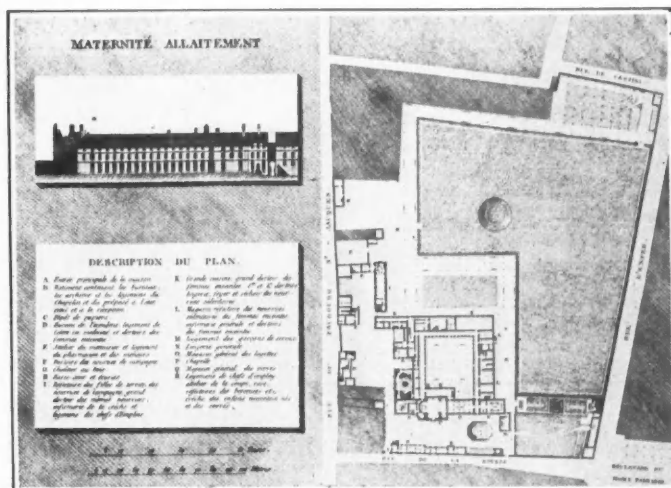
Hôpital de la Maternité. Bessat's ground plan and front elevation, drawn in 1811
